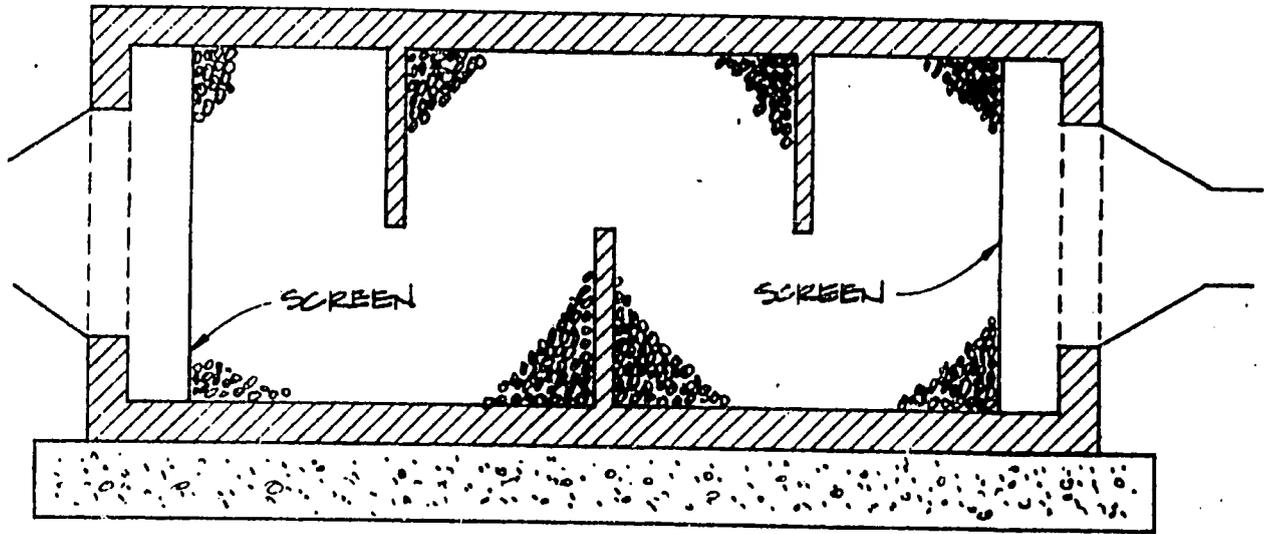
Horizontal Flow Rock Bed (Alternative 1)
